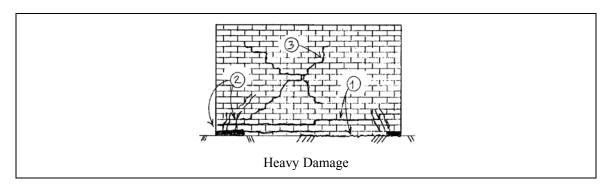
Illustrations on in-plane flexural failure of masonry wall (Flexural Cracking/Toe Crushing/Bed Joint Sliding Case)
